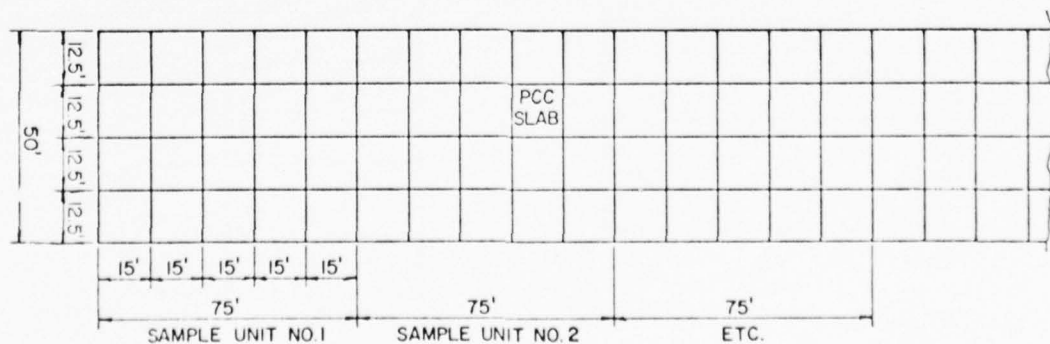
Example division of a pavement section into sample units of 20 slabs.
